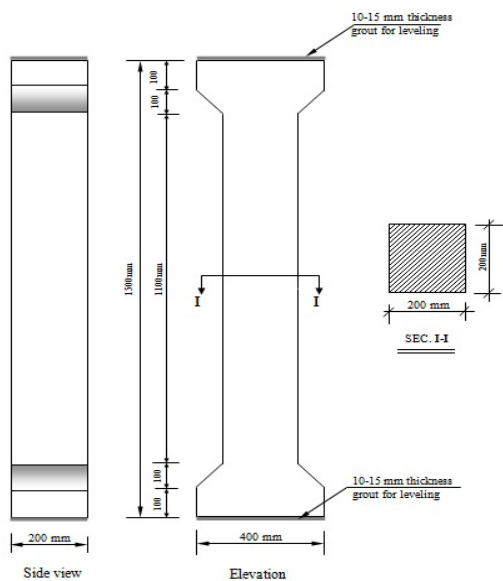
a) Concrete Dimensions of Typical Test Columns (200x200 mm²)
